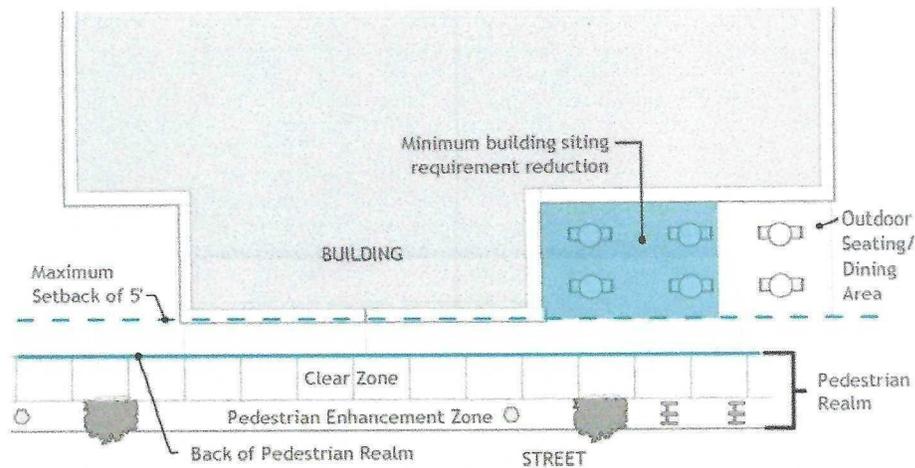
C: Minimum Frontage Requirements- Outdoor Seating and Dining
